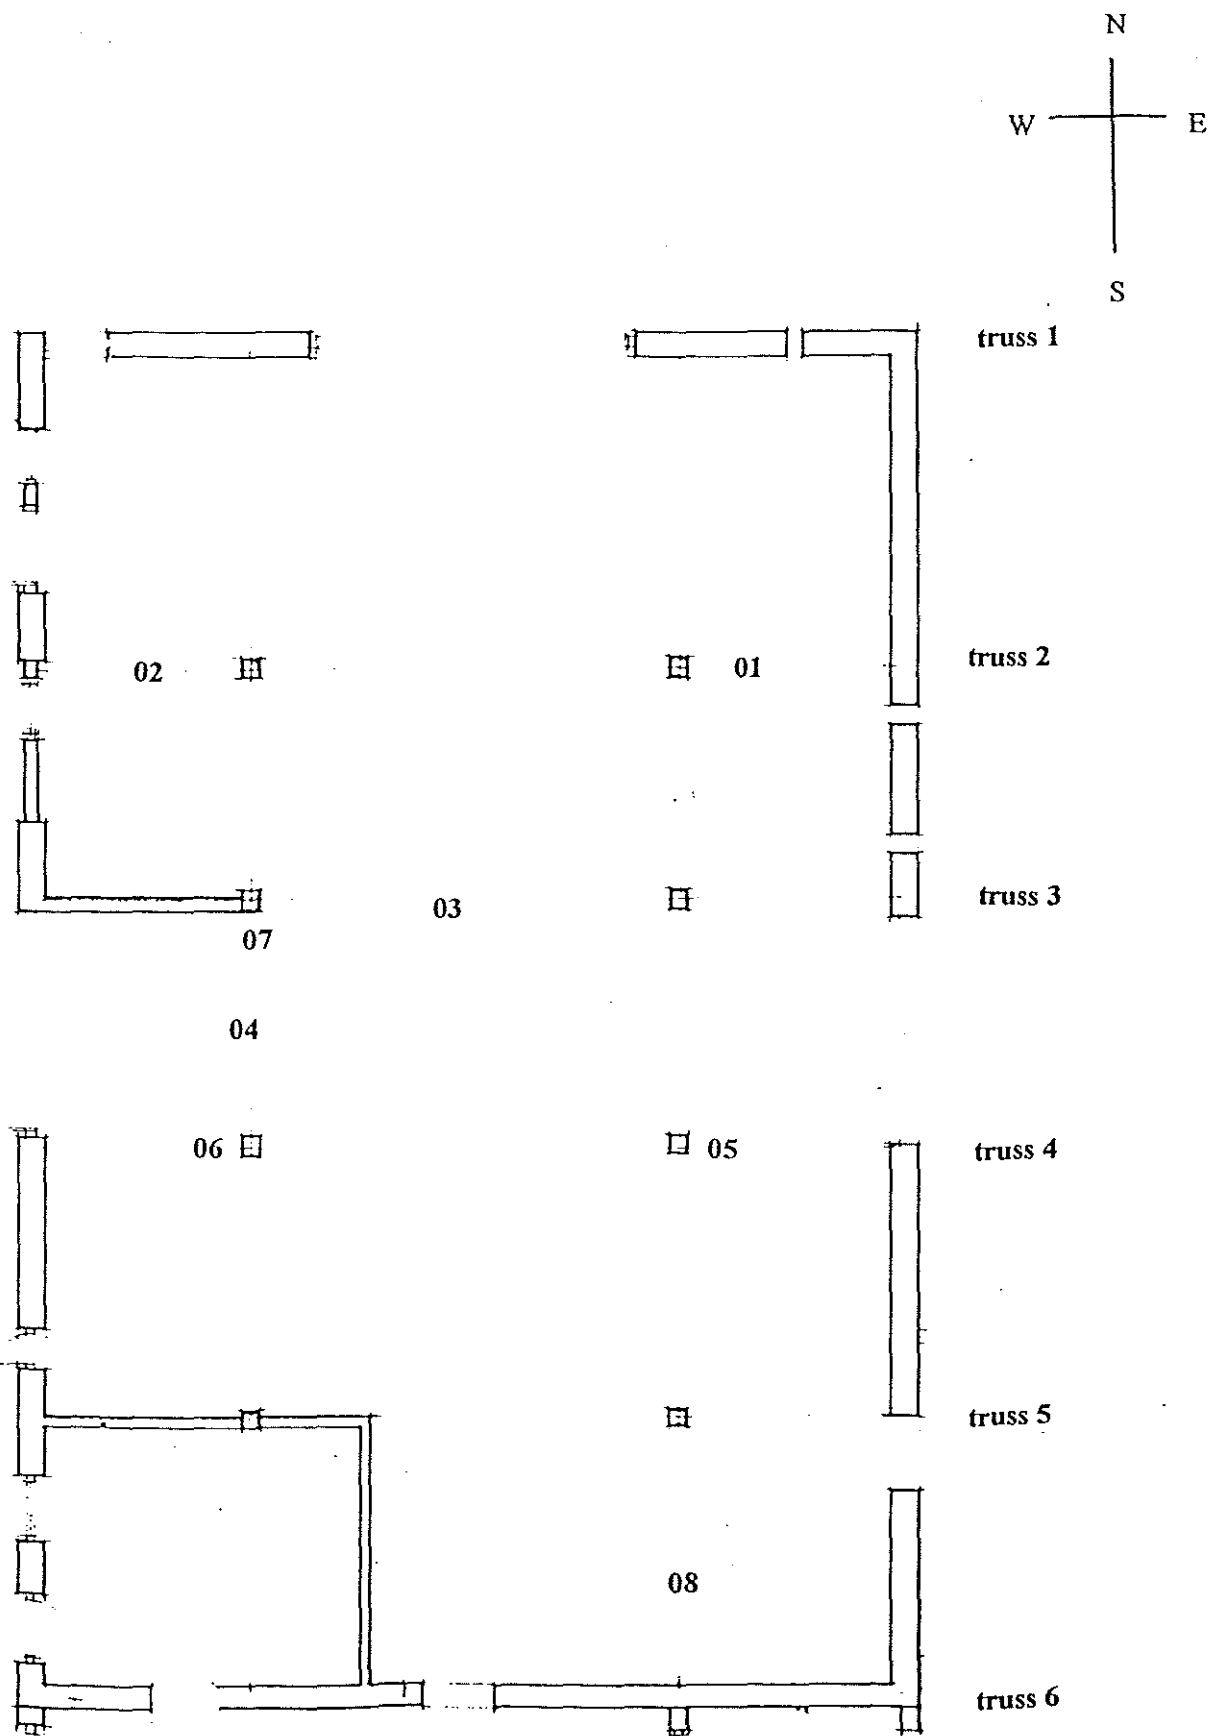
Plan of the trusses in the roof of the farmhouse to show sample locations
